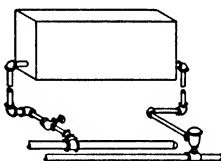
HEATING UNIT WITH VALVES IN BASEMENT
